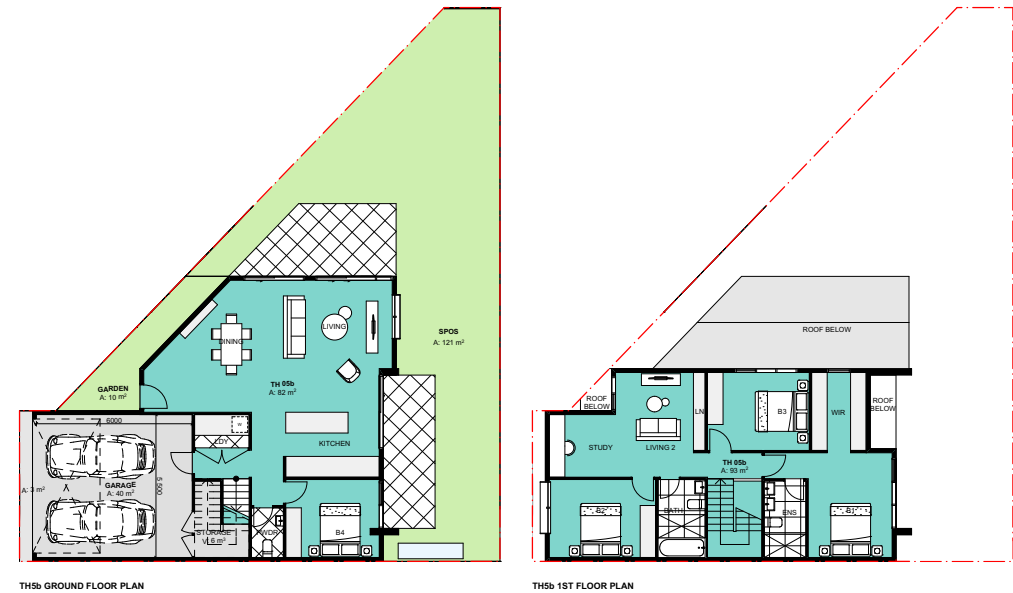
Townhouse Type 05b (Source: Plus Architecture)
